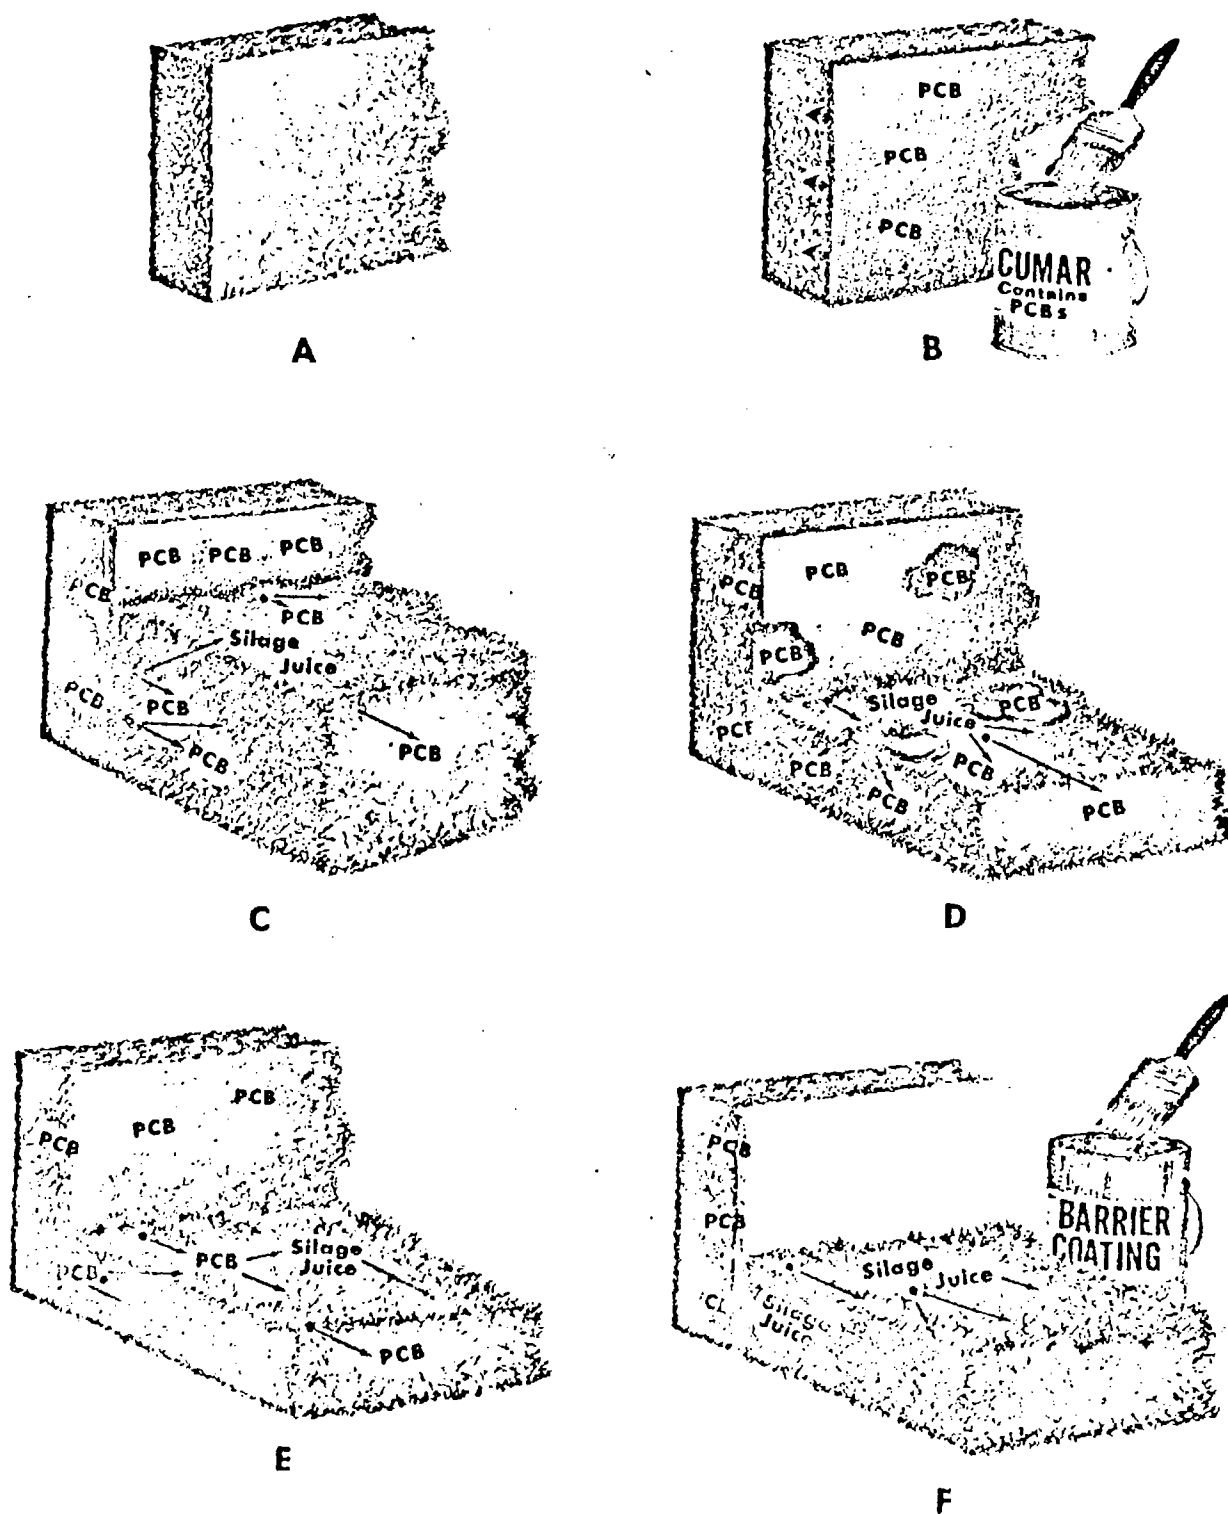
The porous concrete surface of many silos was protected with Cumar which contained PCB's. The PCB's from this coating contaminate the silage when they are dissolved by the silage juices or flake off. Certain barrier coatings can prevent PCB contamination of silage.
